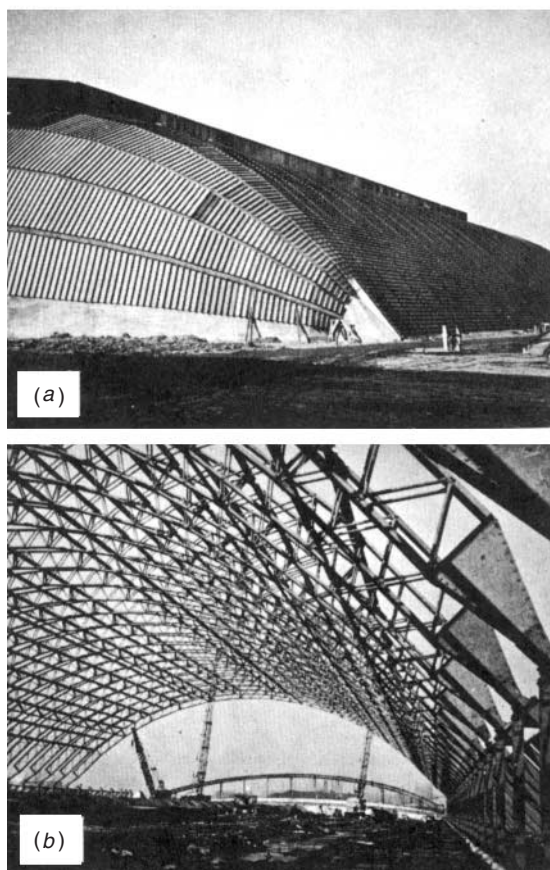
Hangar-type arch structures using cold-formed steel sections. (*Armco Steel Corporation.*)^{1,6}
